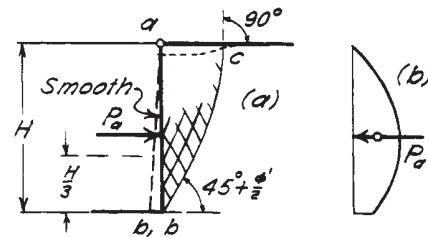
Failure of sand behind smooth vertical wall when deformation condition for active Rankine state is not satisfied. (a) Section through back of wall; (b) stress against back of wall.
